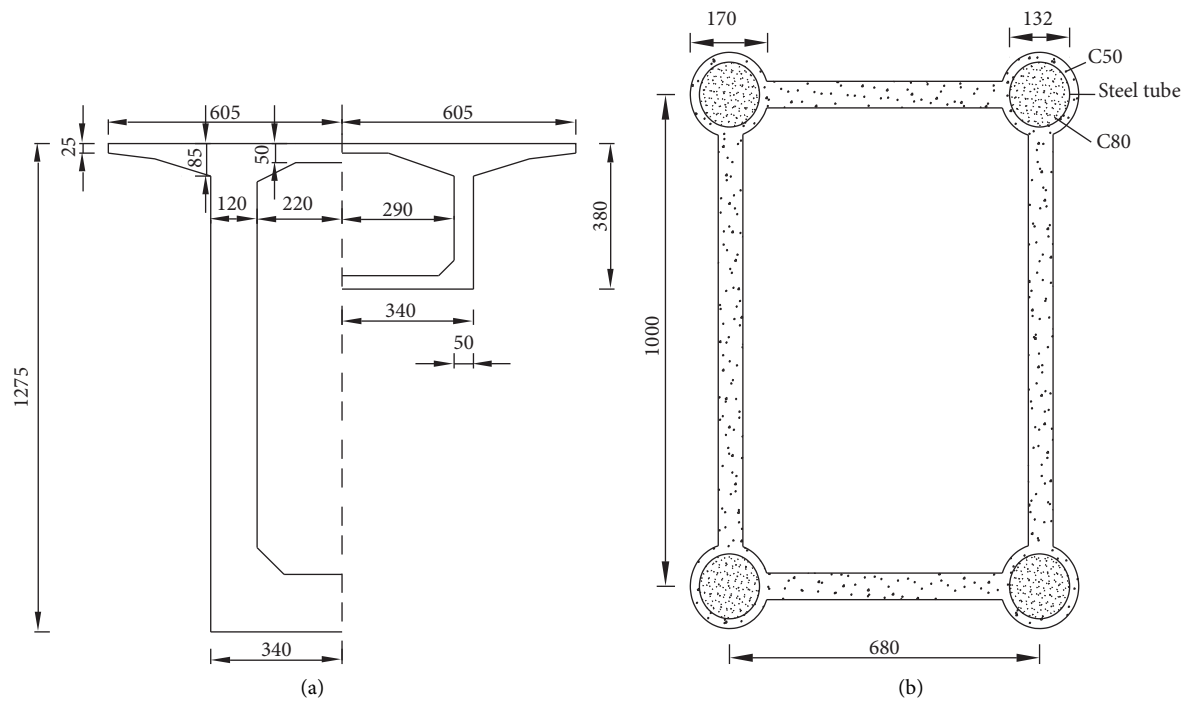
Dimensions of cross-sections of Labajin Bridge: (a) girders; (b) piers.
